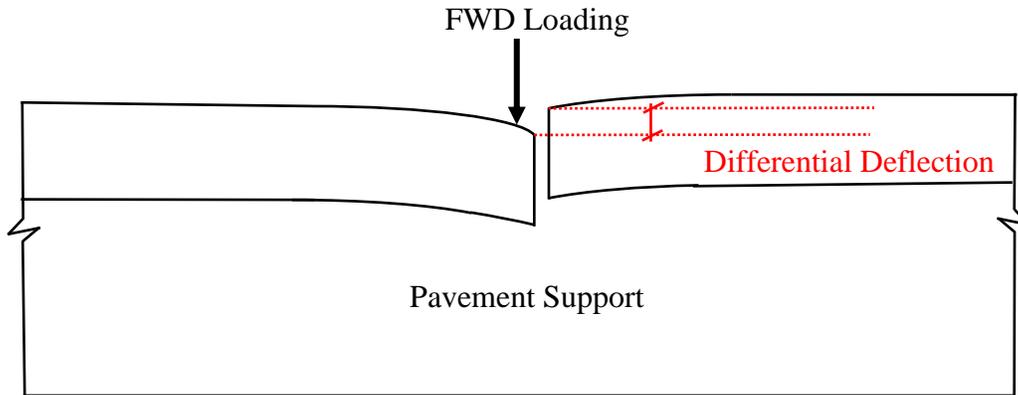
Illustration of Differential Deflection in Concrete Pavements.
